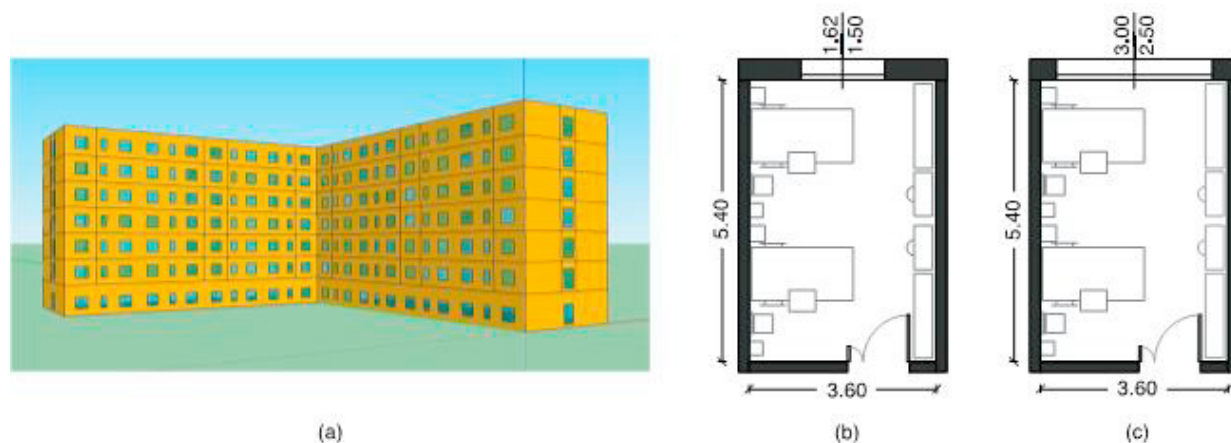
Perspective view of the reference hospital building (a) and floor plans of the tested patient room with the two different window sizes: 25% WWR window (b) or 77% WWR window (c).
